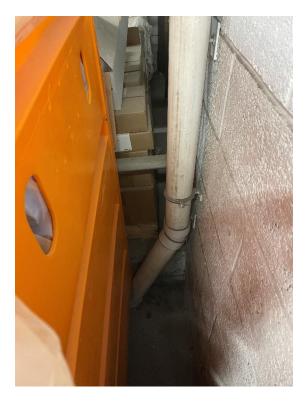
View of SSDS riser at suction point #8, bollard installation recommended for protection.
